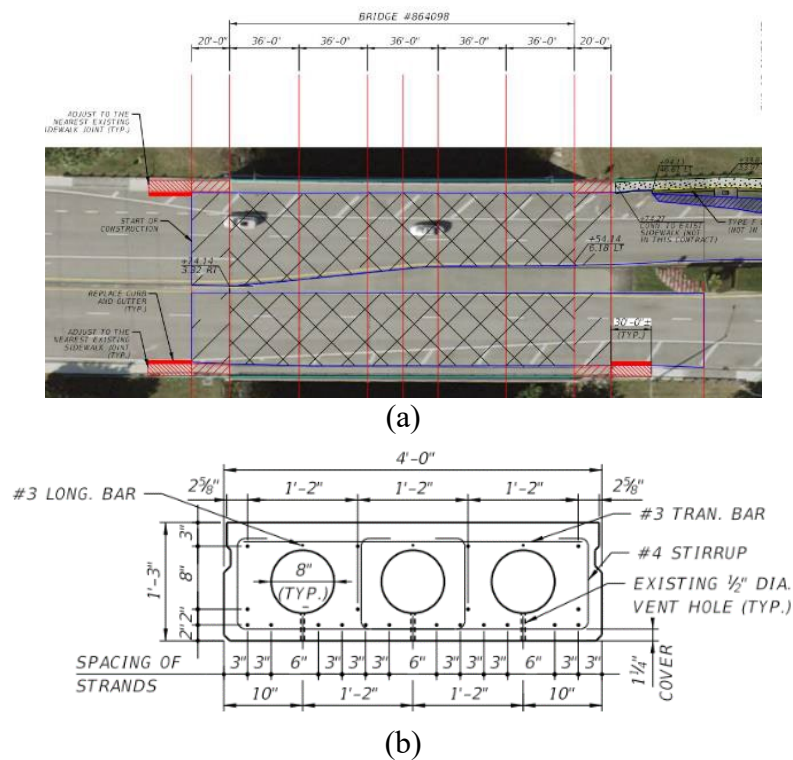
Sonovoid® bridge, located in Broward County, FL: (a) aerial view, and (b) typical unit section (1 in.=25.4 mm; 1 ft. = 305 mm)
